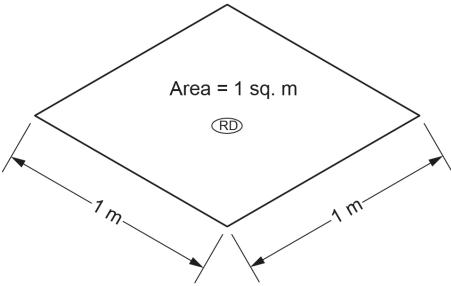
1 m^2 roof surface. (Skilled Trades BC, 2021) Used with permission.
